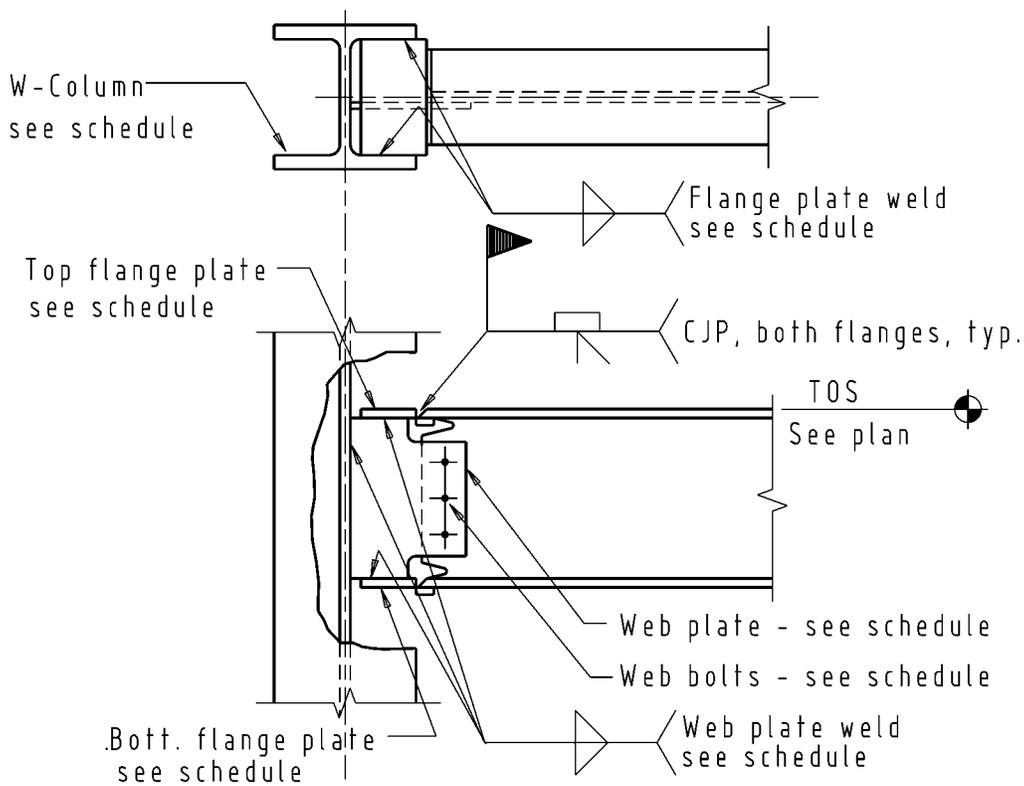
Structural design drawing—bolted moment connection detail.
